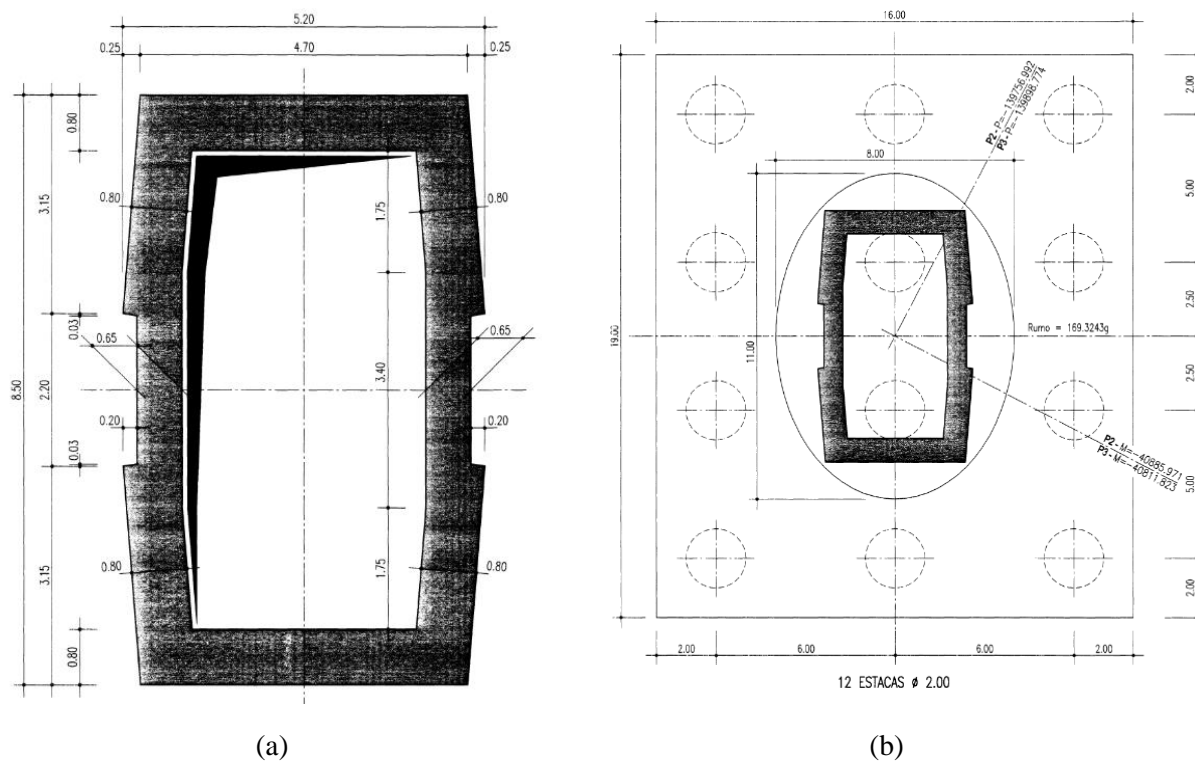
Cross section of the piers (GRID et al., 2006): (a) floor-plan and (b) floor-plan including foundations.
